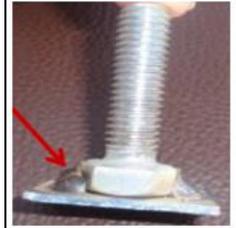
Inadequate anchored rail and beam (e.g. welded instead of bolted)
